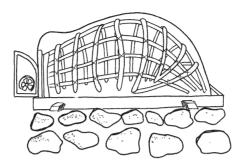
a view of a Quebec oven, showing the boulder foundation, the withy or lath framwork on which the clay envelope is formed, and the iron doors in place.
